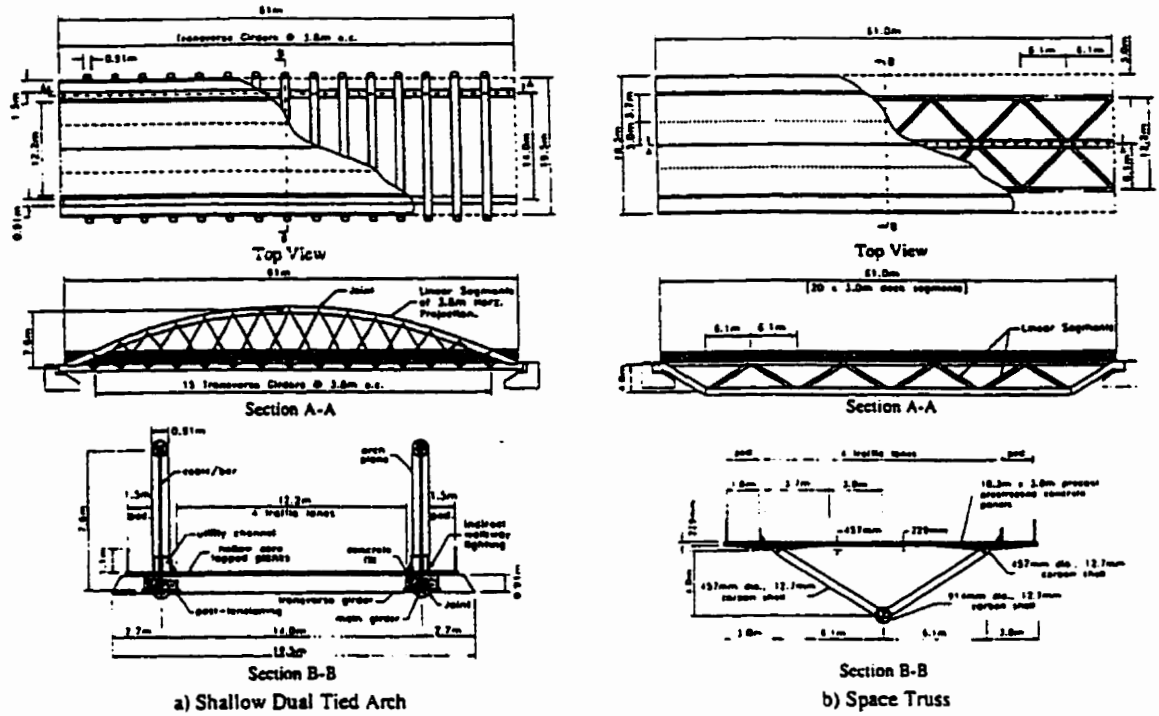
Carbon shell space truss bridge systems [Seible 1996]
